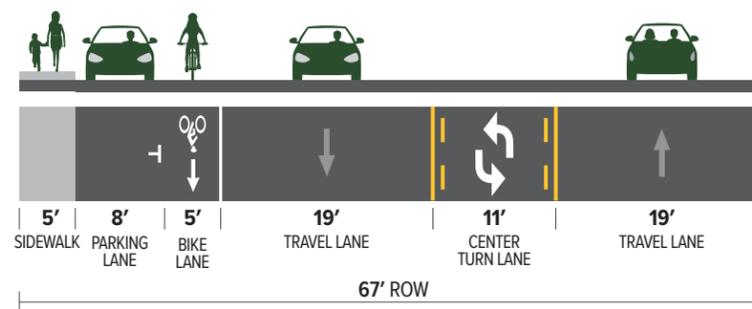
MAIN AVENUE TO BELL AVENUE EXISTING CROSS SECTION
